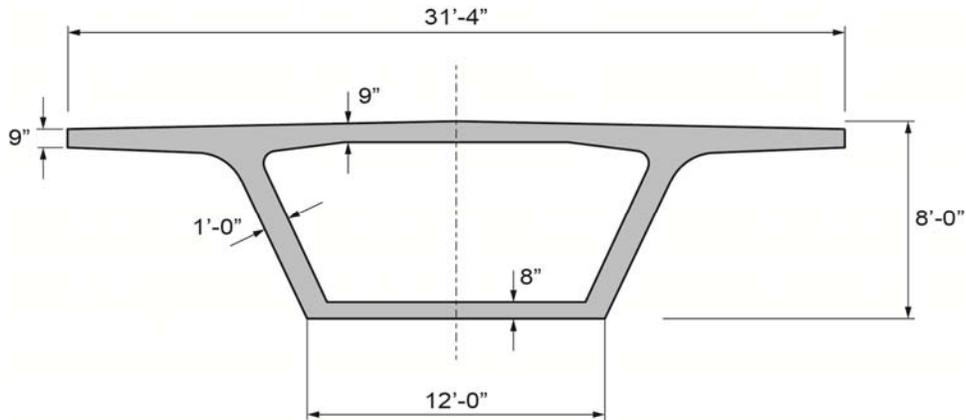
Cross Section for the 132'-6" Span Bridge shown in Alternate 1
